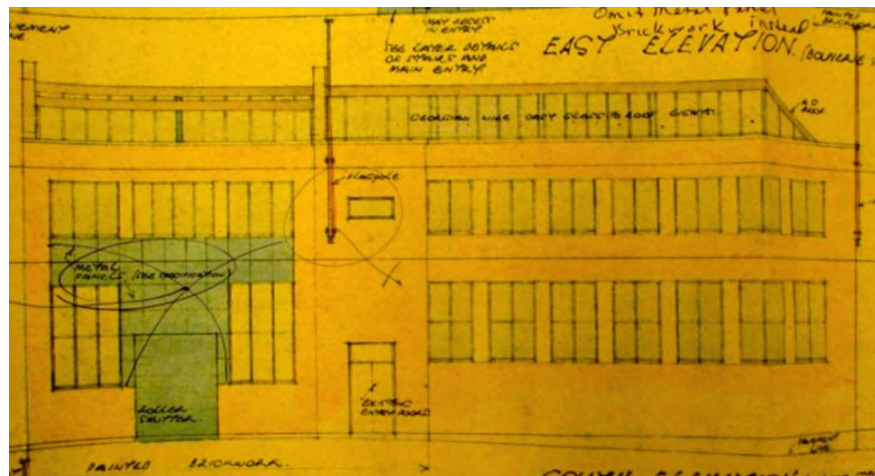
1956 permit drawings showing additions and remodelling to the Pelham Street façade. Source: Public Records Office Victoria.
